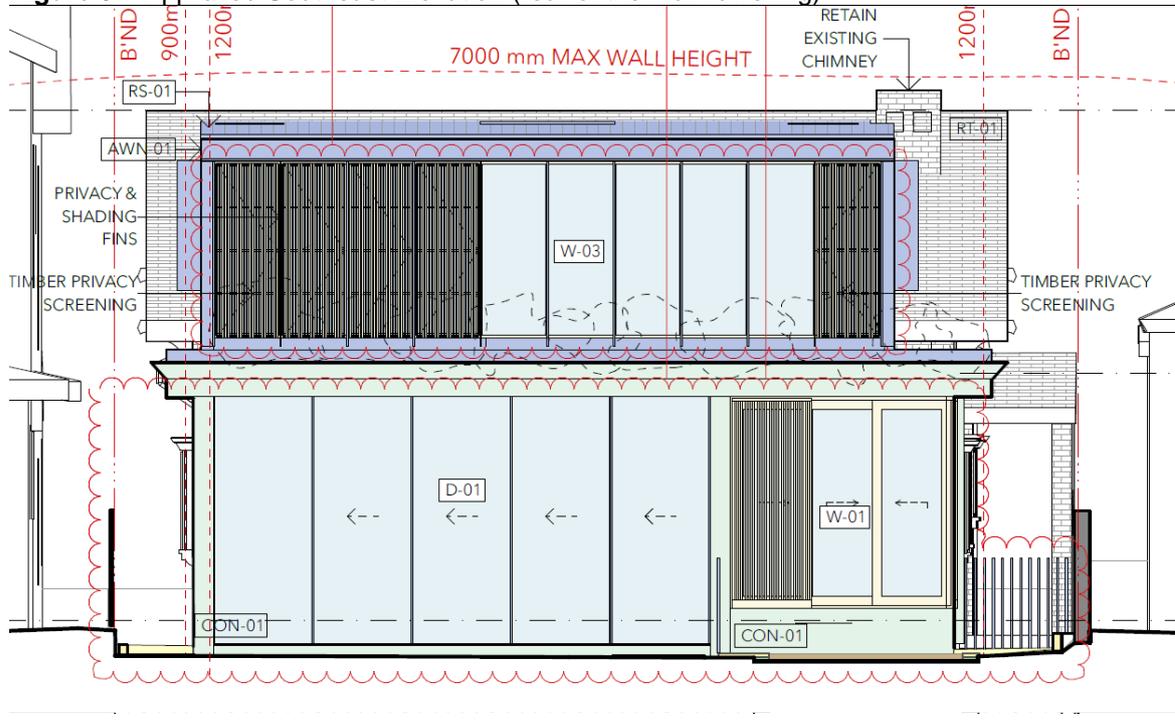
Proposed Modified Southeast Elevation (rear of the main dwelling)
